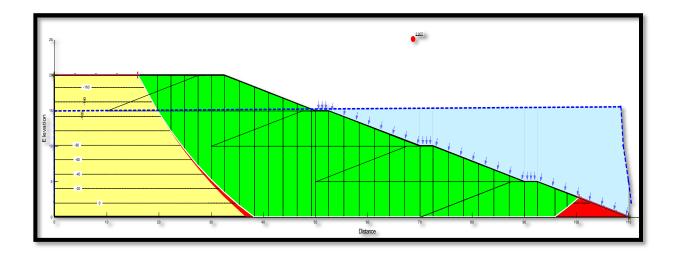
Embankment cross section for 1:3.5 slope at 15 m water level
